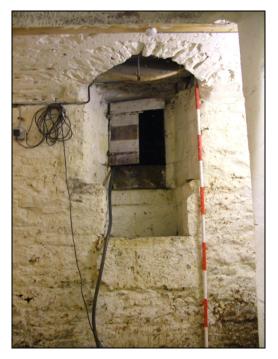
Recess in north-west wall of cellar, with small wooden door and stone sink
